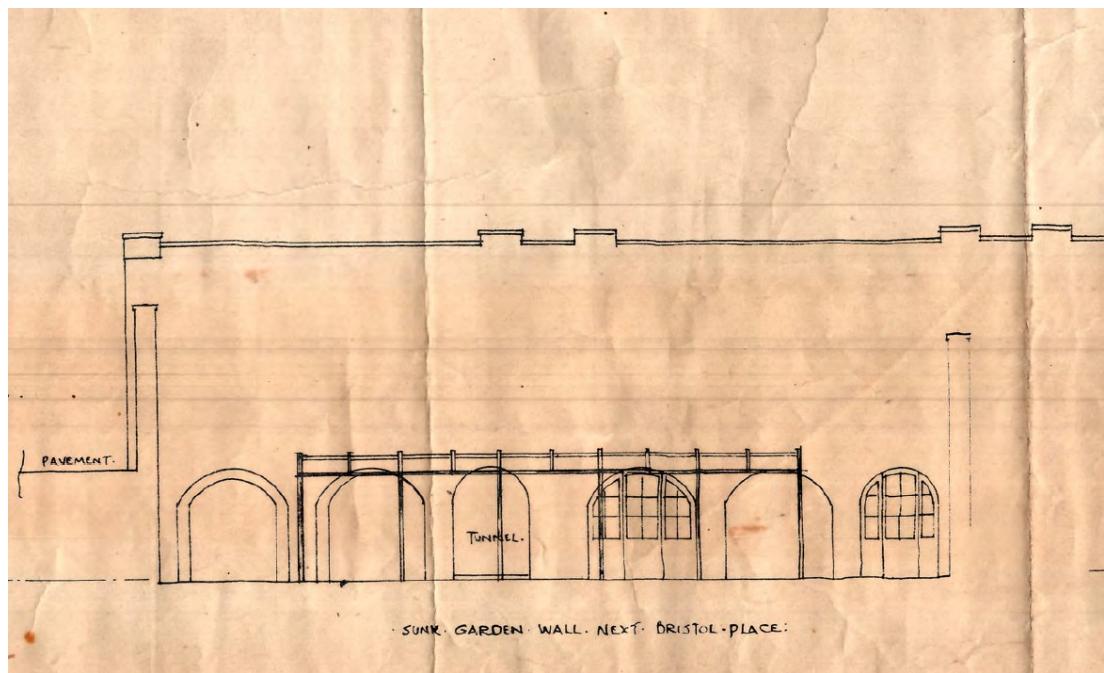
Lutyens' sketch of the tunnel and arches east of Bristol Place.
